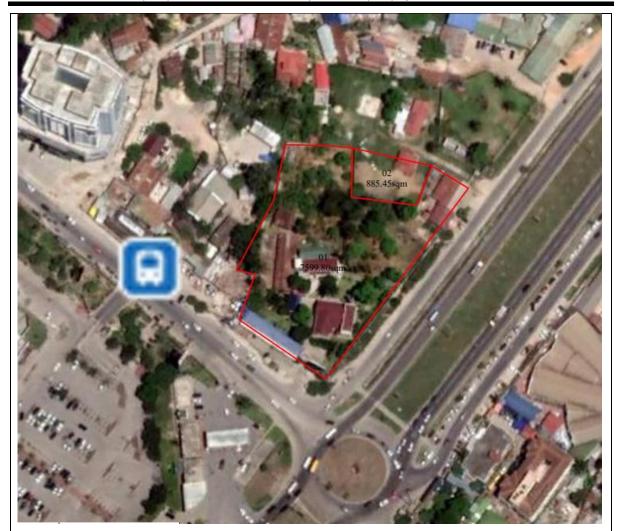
Mlalakua Car Park Site Plan and Surrounding Environment.
